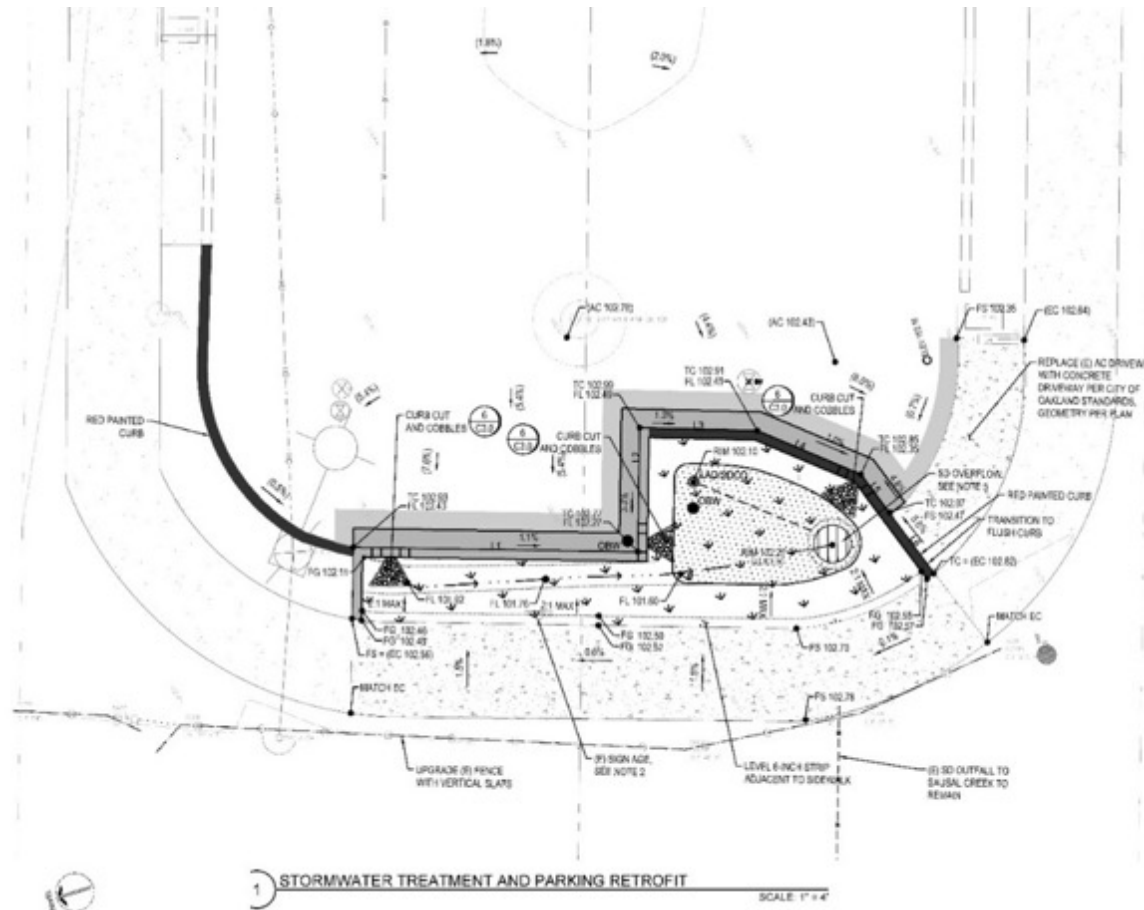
Permitted stormwater bioretention facility design. Credit: Sherwood Design Engineers
